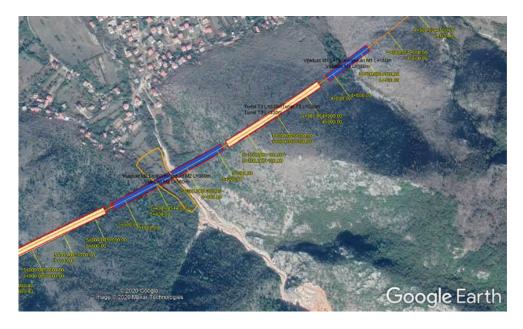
Third considered construction waste landfill site (orange polygon) (Source: Google Earth)
